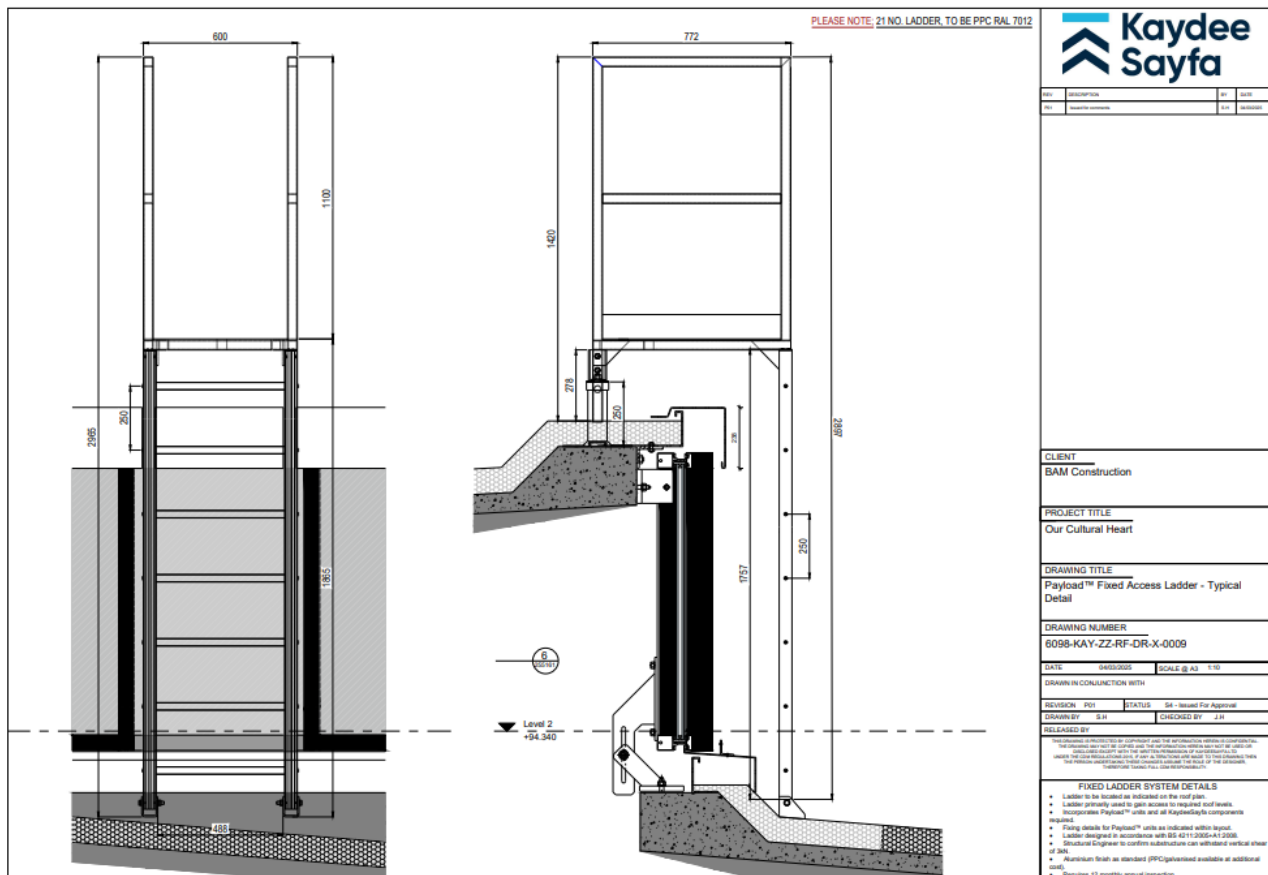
6098-KAY-ZZ-RF-DR-X-0009 Proposed Fixed Roof Access Ladder Design Plan
